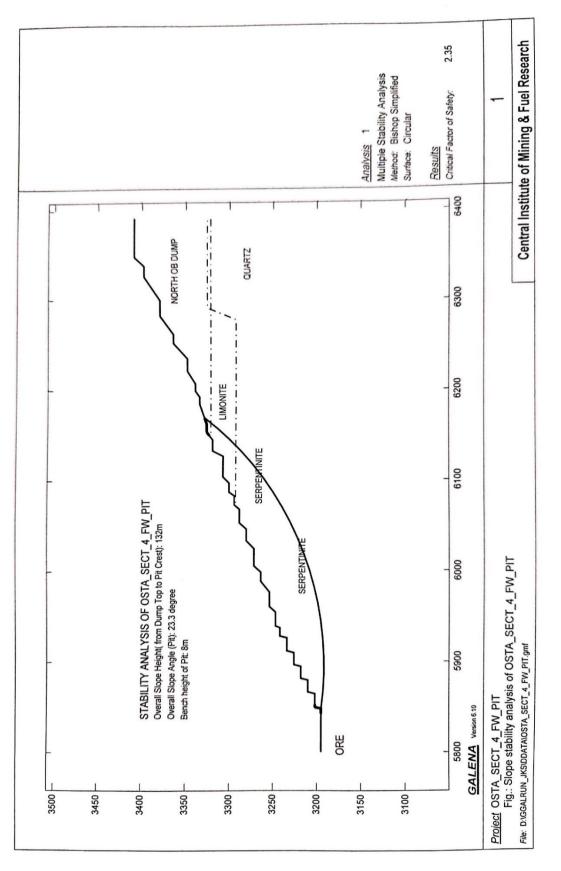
Slope stability analysis of Footwal Pit along Section Sect-4
